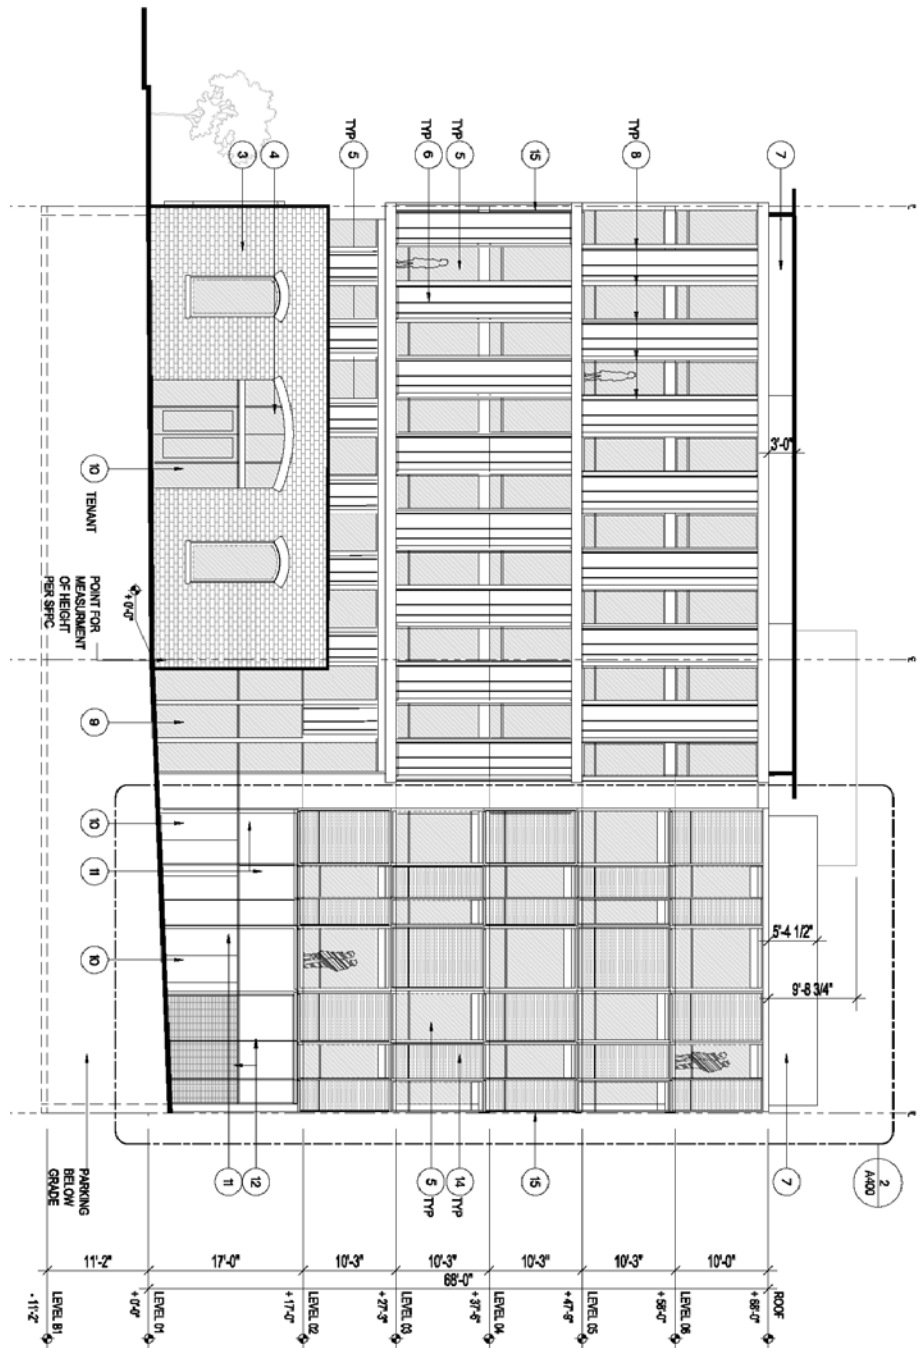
PROPOSED SOUTH ELEVATION (19TH STREET)
